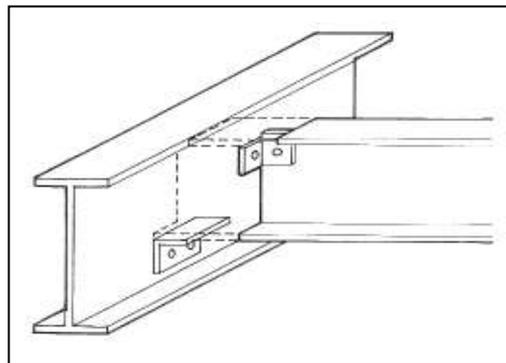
Beam-to-girder connection using seating and restraining cleats.
